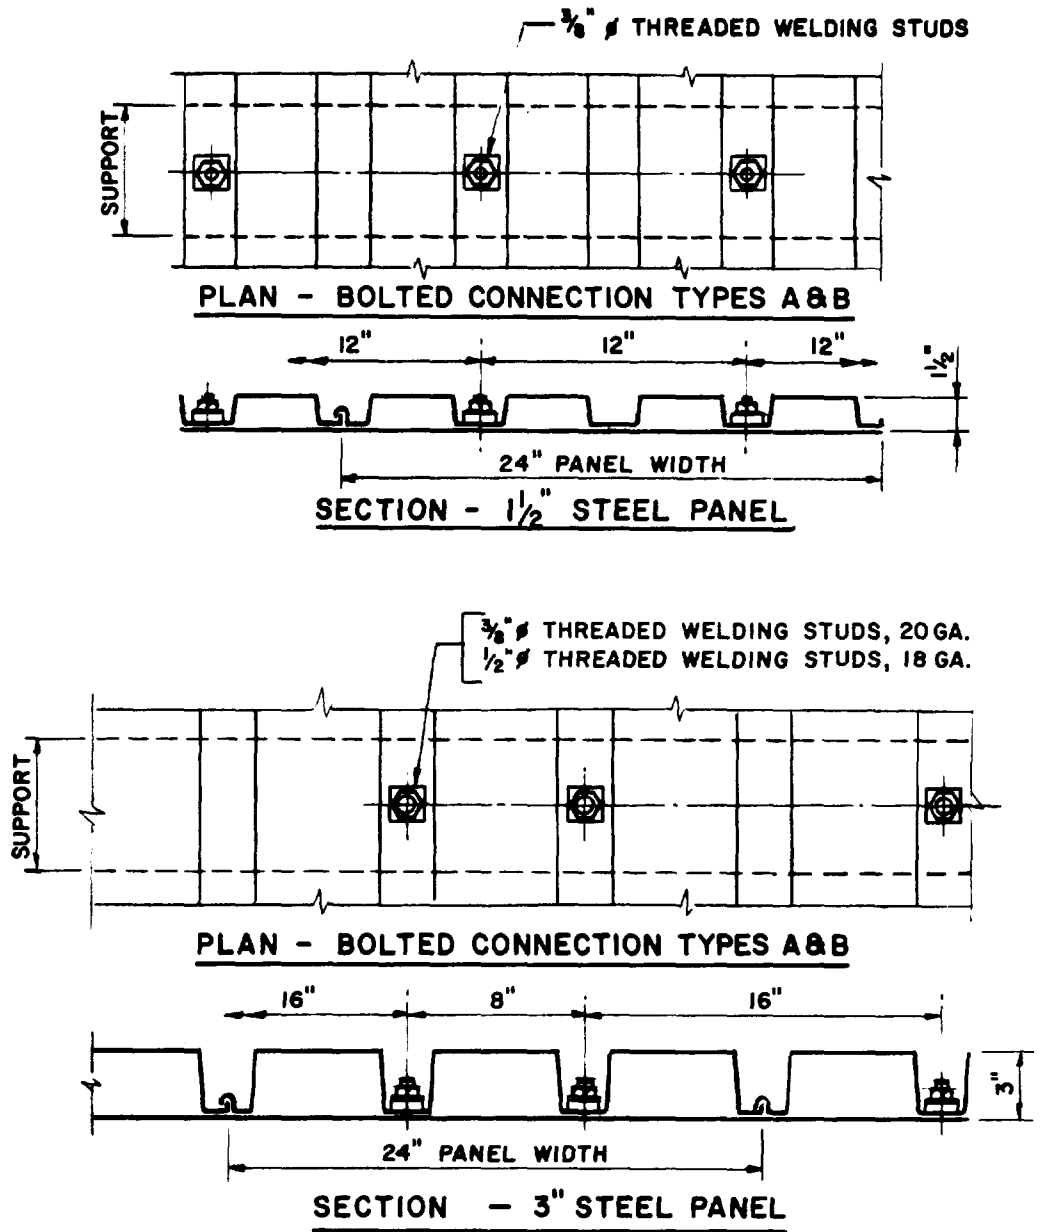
Typical bolted connections for attaching cold-formed steel panels to supporting members
